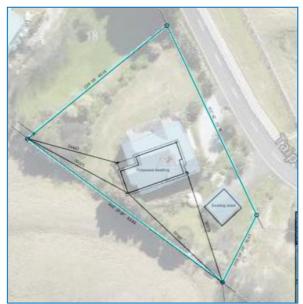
Proposed building envelope overlaid onto aerial photograph showing previous dwelling.
